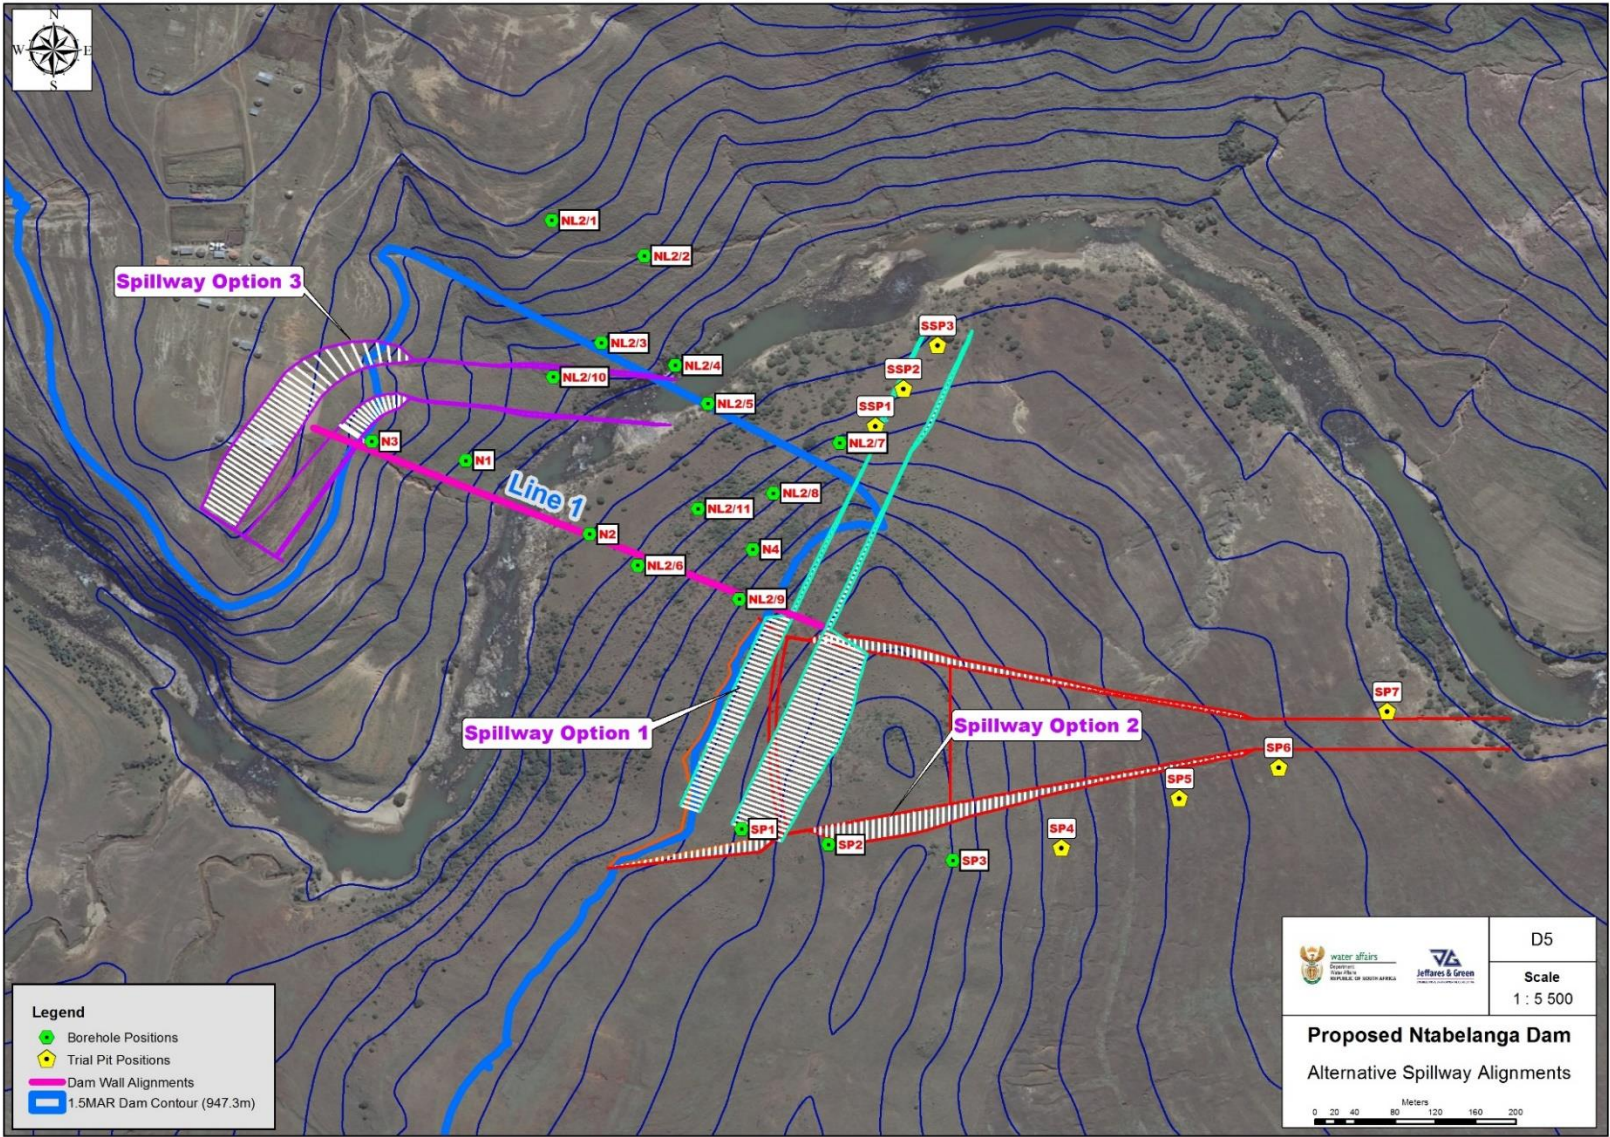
Site Plan Showing Alternative Spillway Alignments
